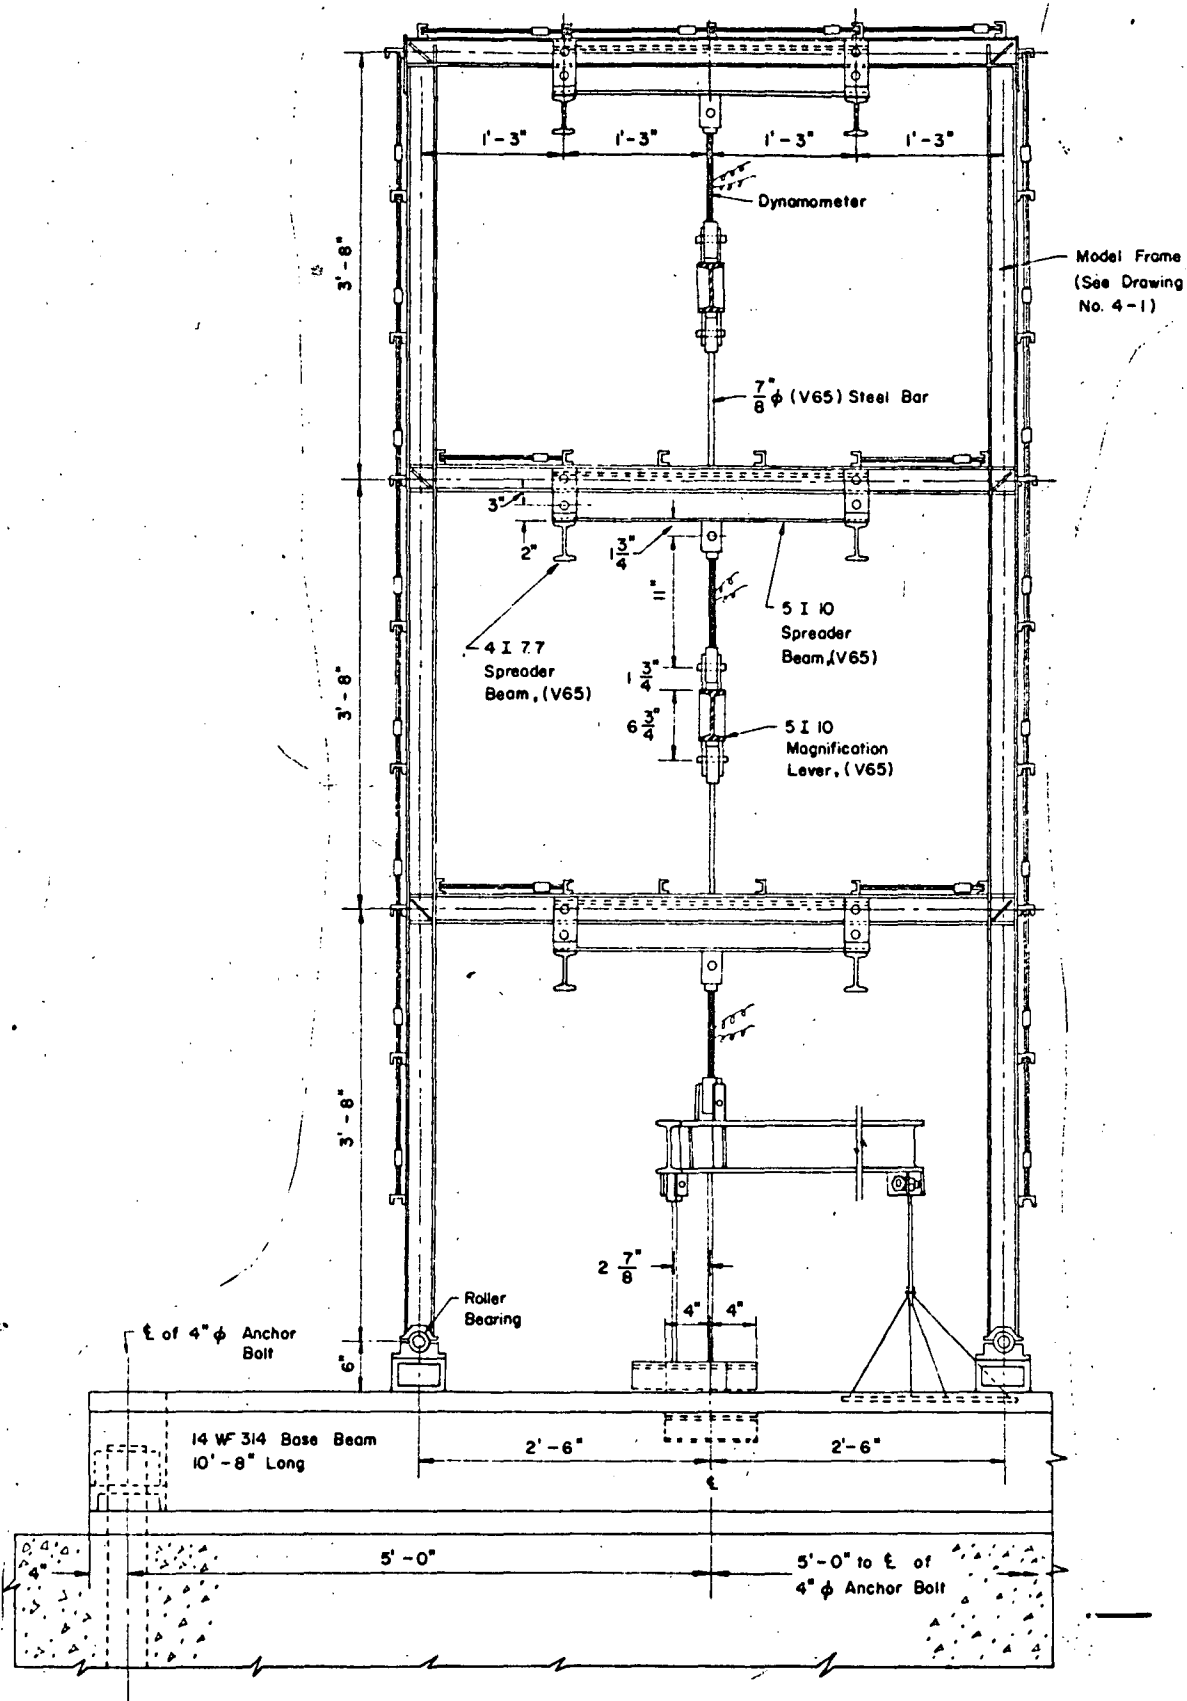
MODEL FRAME TEST SETUP - SECTION E-E
